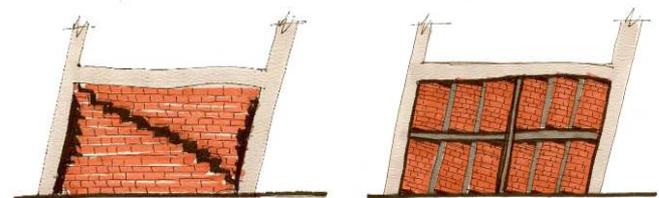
These diagrams show the conceptual difference between the earthquake performance of a standard masonry infill wall (left) and an Armature Crosswall (right) in reinforced concrete frame construction. The sub-frame (which in modern construction can be of any material including concrete or steel, not only timber), holds the brick masonry panels in place, allowing the deformation of the system without the likelihood of the development of diagonal tension “X” cracks that can lead to the rapid collapse of the wall. An important component of the Armature Crosswall system is the use of mortar that is soft and weaker than the masonry units, such as lime or clay mortar rather than cement mortar. The initial stiffness of the standard infill wall, which is usually laid up with cement mortar, also can cause the surrounding frame to be broken leading to its collapse, while the Armature Crosswall is much less stiff at the onset of shaking, allowing “frame action” to take place.
